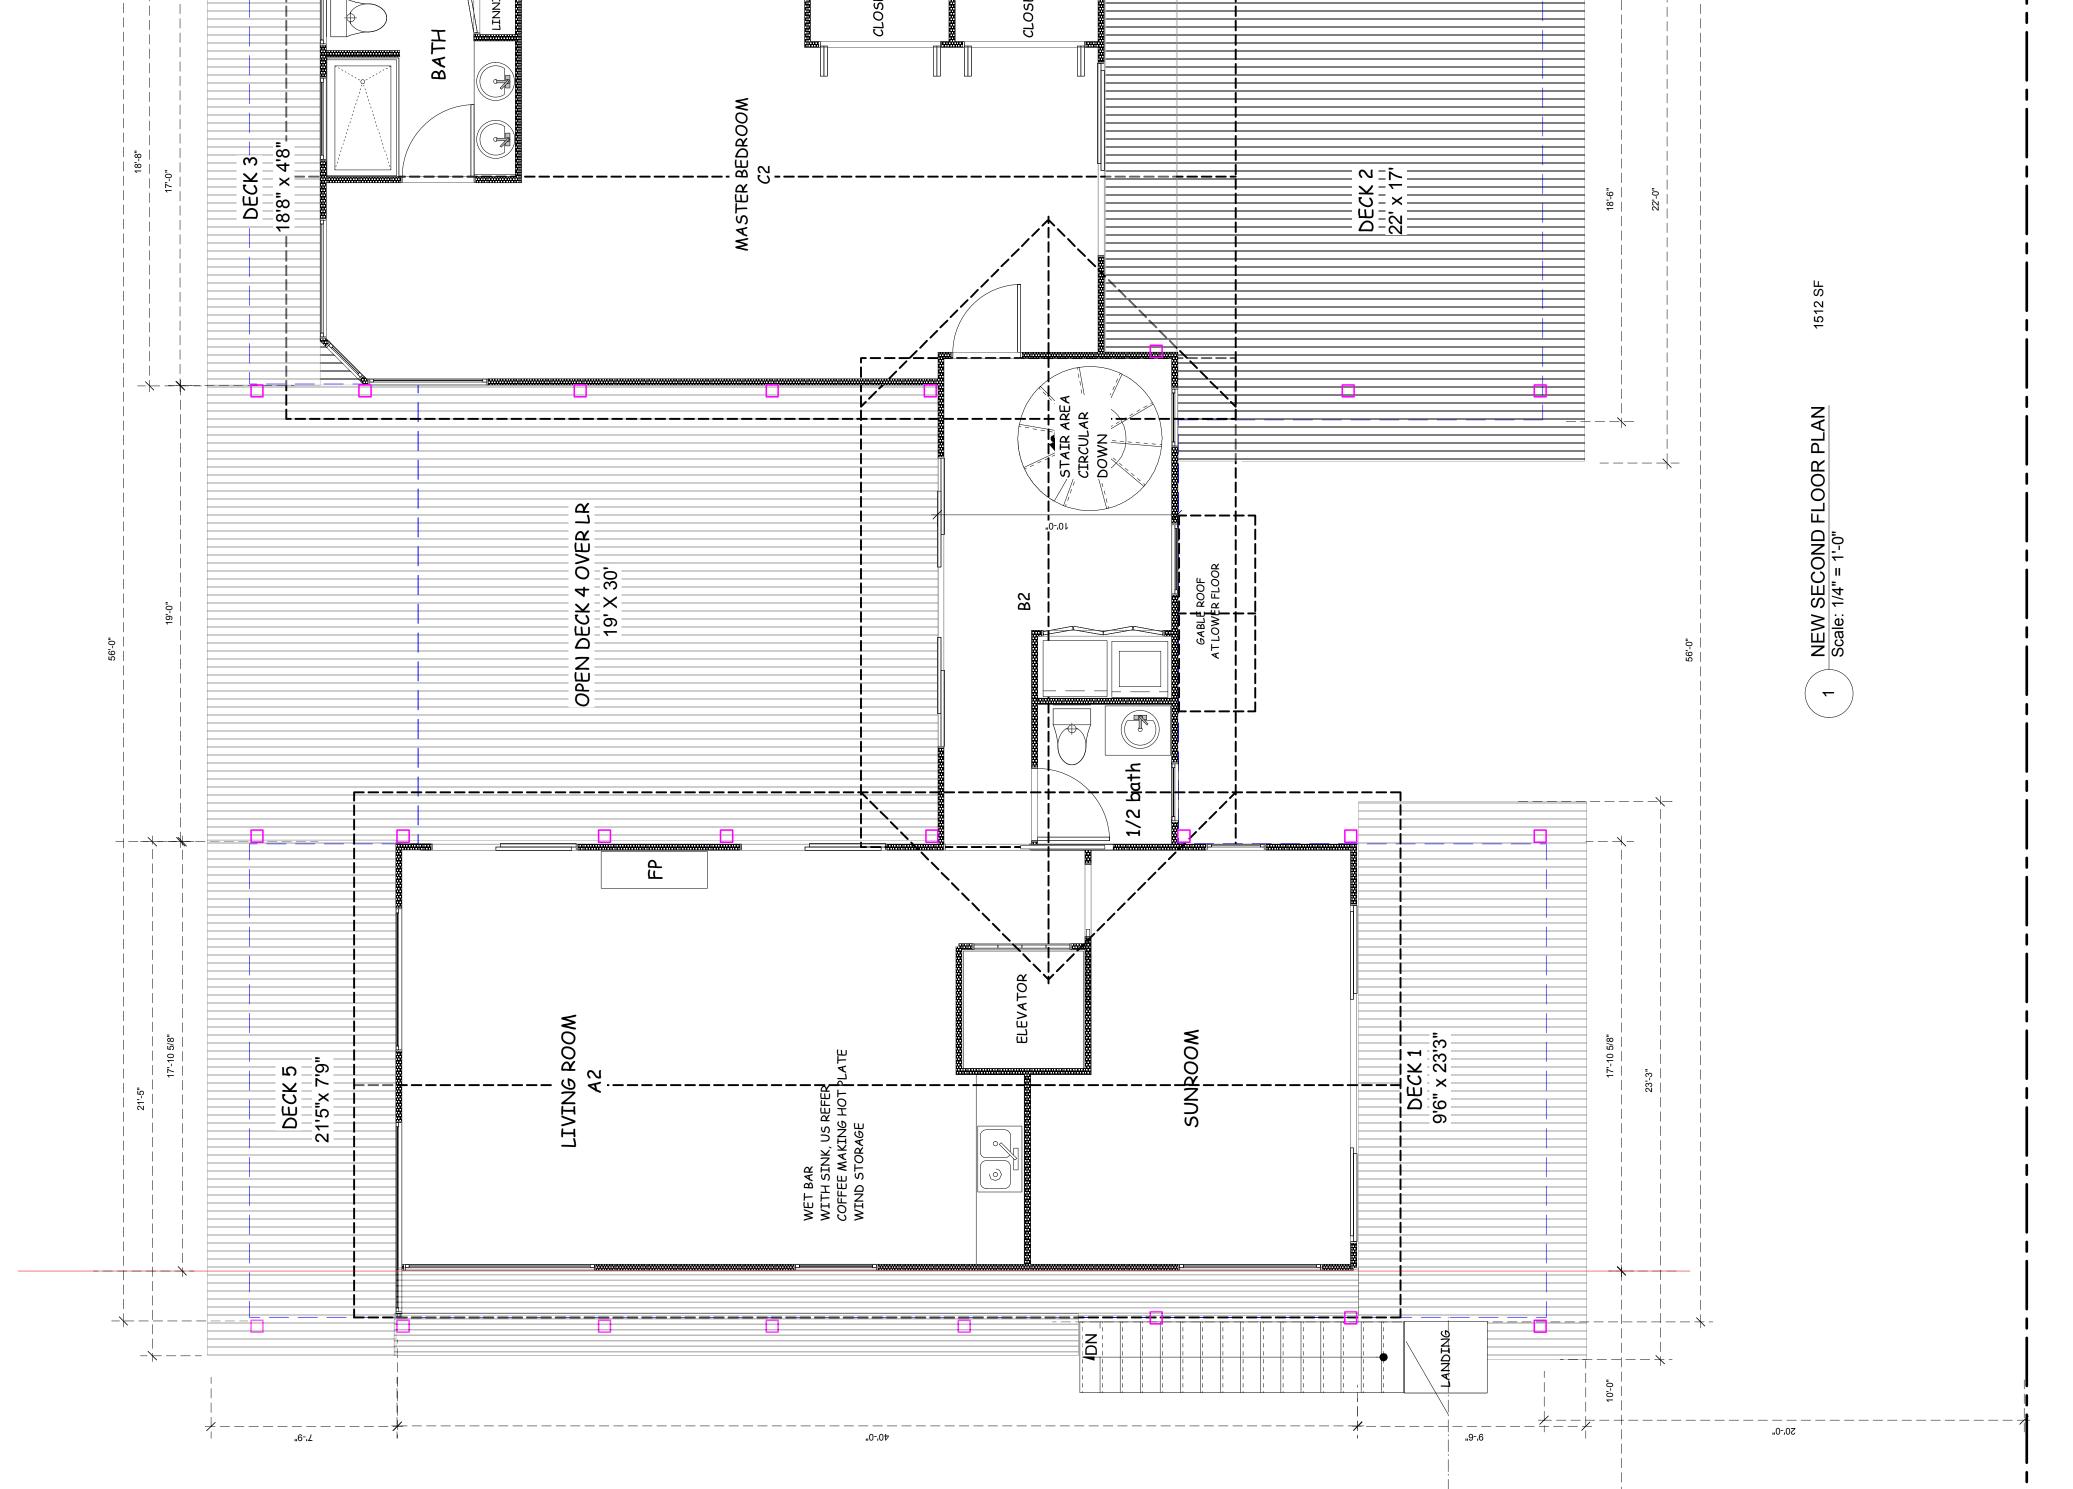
Project Plans A-3-SCO-14-0014 Page 3 of 4
